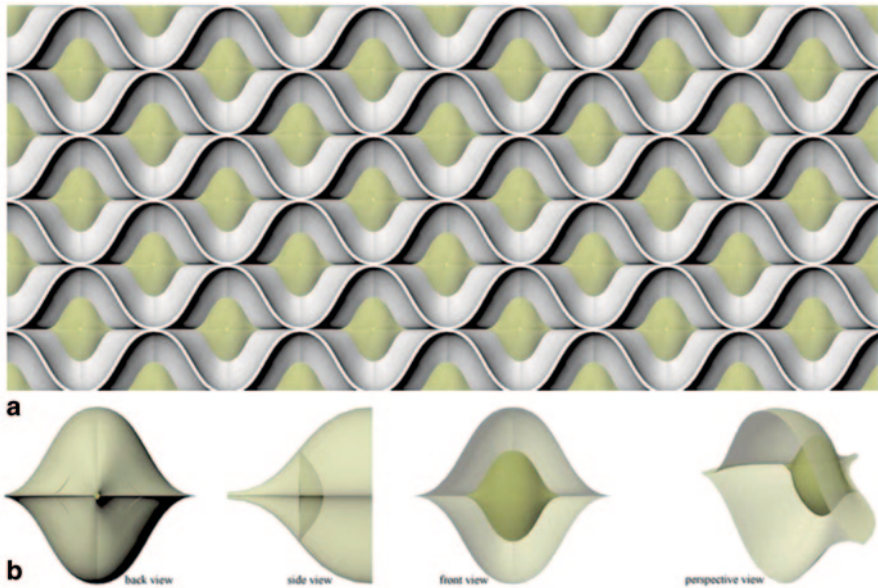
a Arrangement in an envelope system. b Elevations and section
